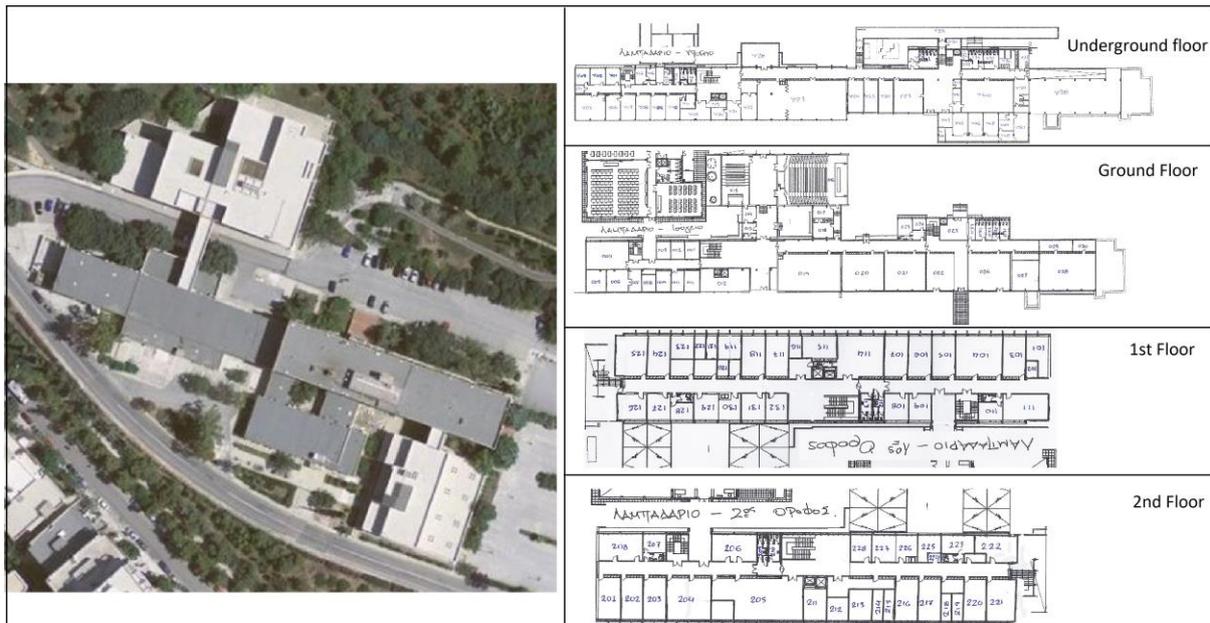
Orthophoto of the case-study area at the scale of 1:1000 (left) and the floor plans of the underground floor (top right), the ground floor (2nd row right from the top), first floor (3rd row right from the top) and second floor (bottom row right)
